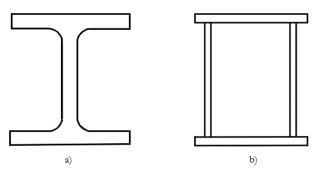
Profiles of main girders: a) I-rolled joist, b) box girder
